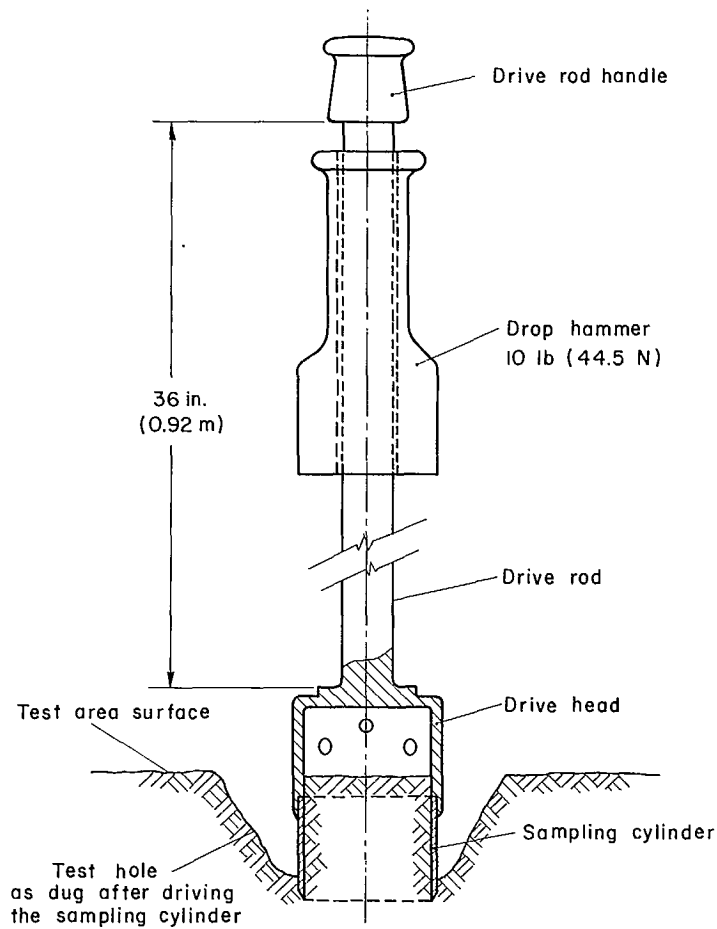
Schematic drawing of the equipment, indicating the principle of the drive-cylinder method.
